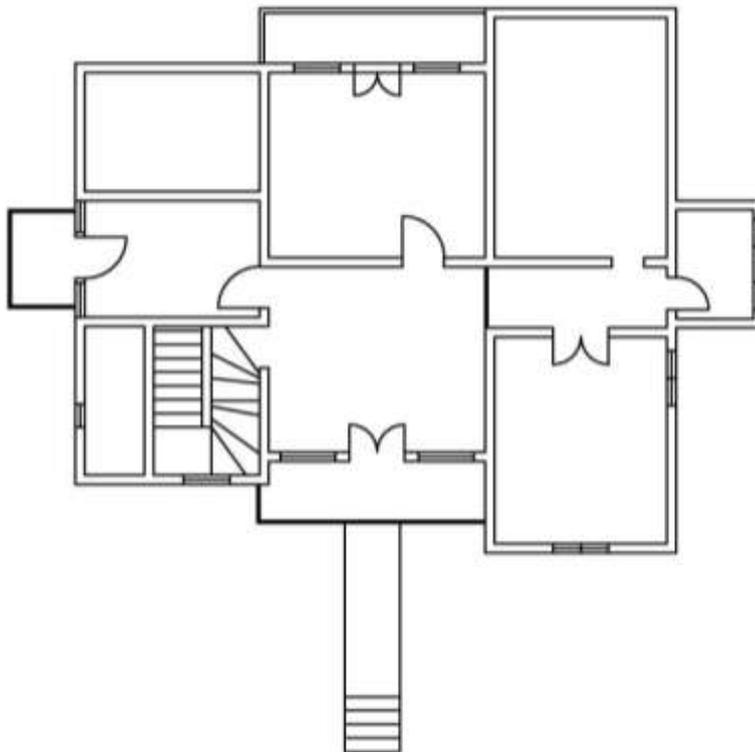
The second floor plan of the house at 140 lot 4 parcel
